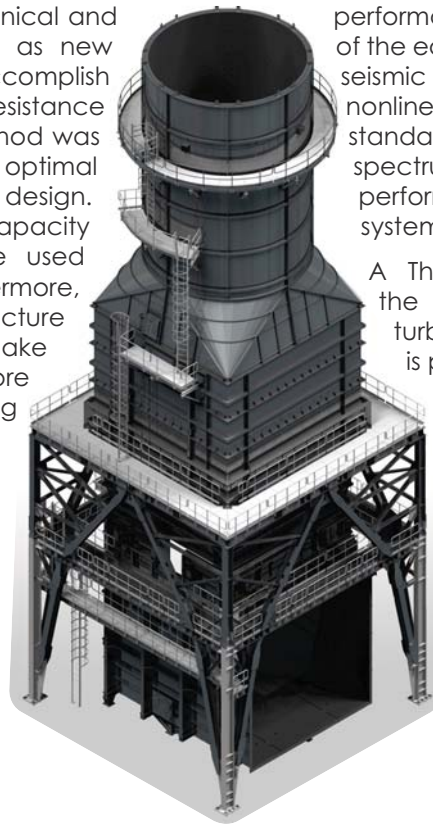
3D view of the MGT-80 gas turbine exhaust system model
